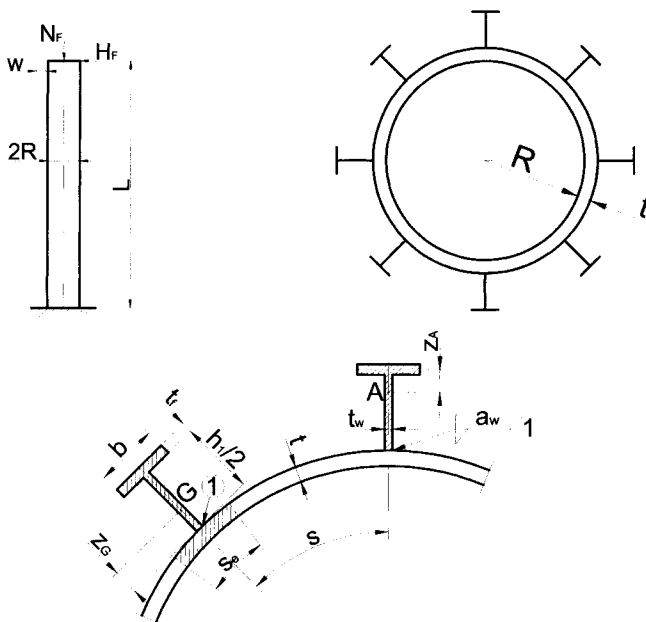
A column constructed as a stiffened cylindrical shell loaded by a compression force N_F and a horizontal force H_F . Cross-section and a detail of the cross-section with outside stiffeners of halved rolled I-section. The horizontal displacement of the top (w) is limited
